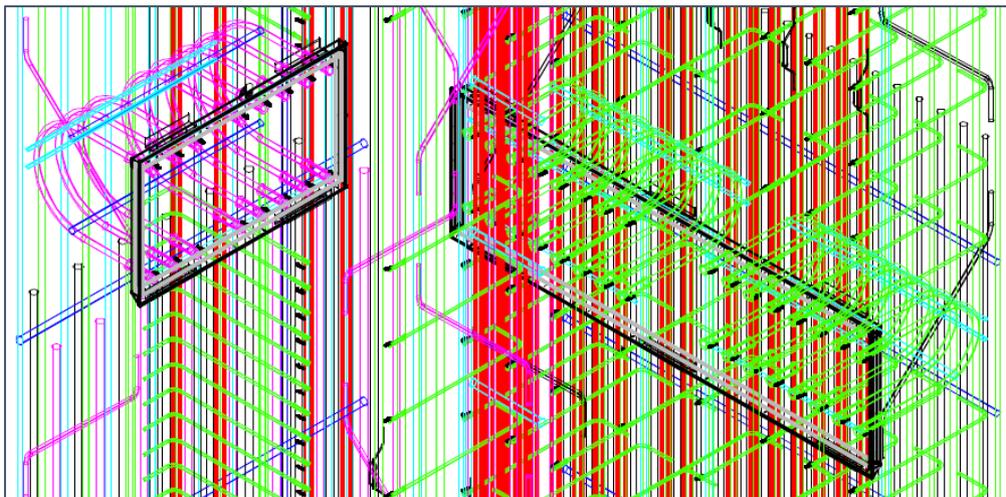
Sample from 3D CAD model of cages at Paddington showing density of reinforcement and how U-bars for slab connections create a horizontal restriction to the flow of concrete within the panel.
